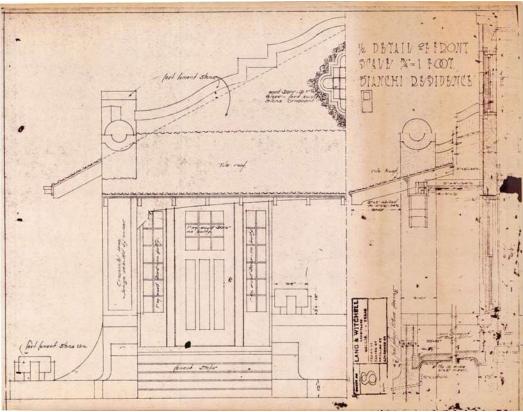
Original Lang and Witchell Front Porch Detail Sheet – Sheet 8
